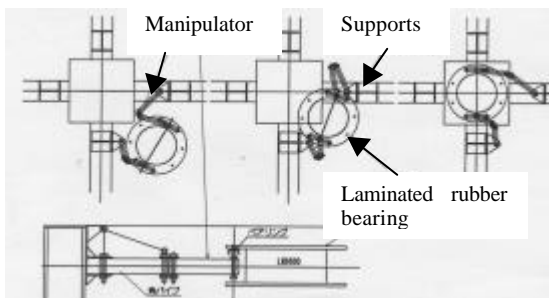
Prototype manipulators which handles laminated rubber bearing
